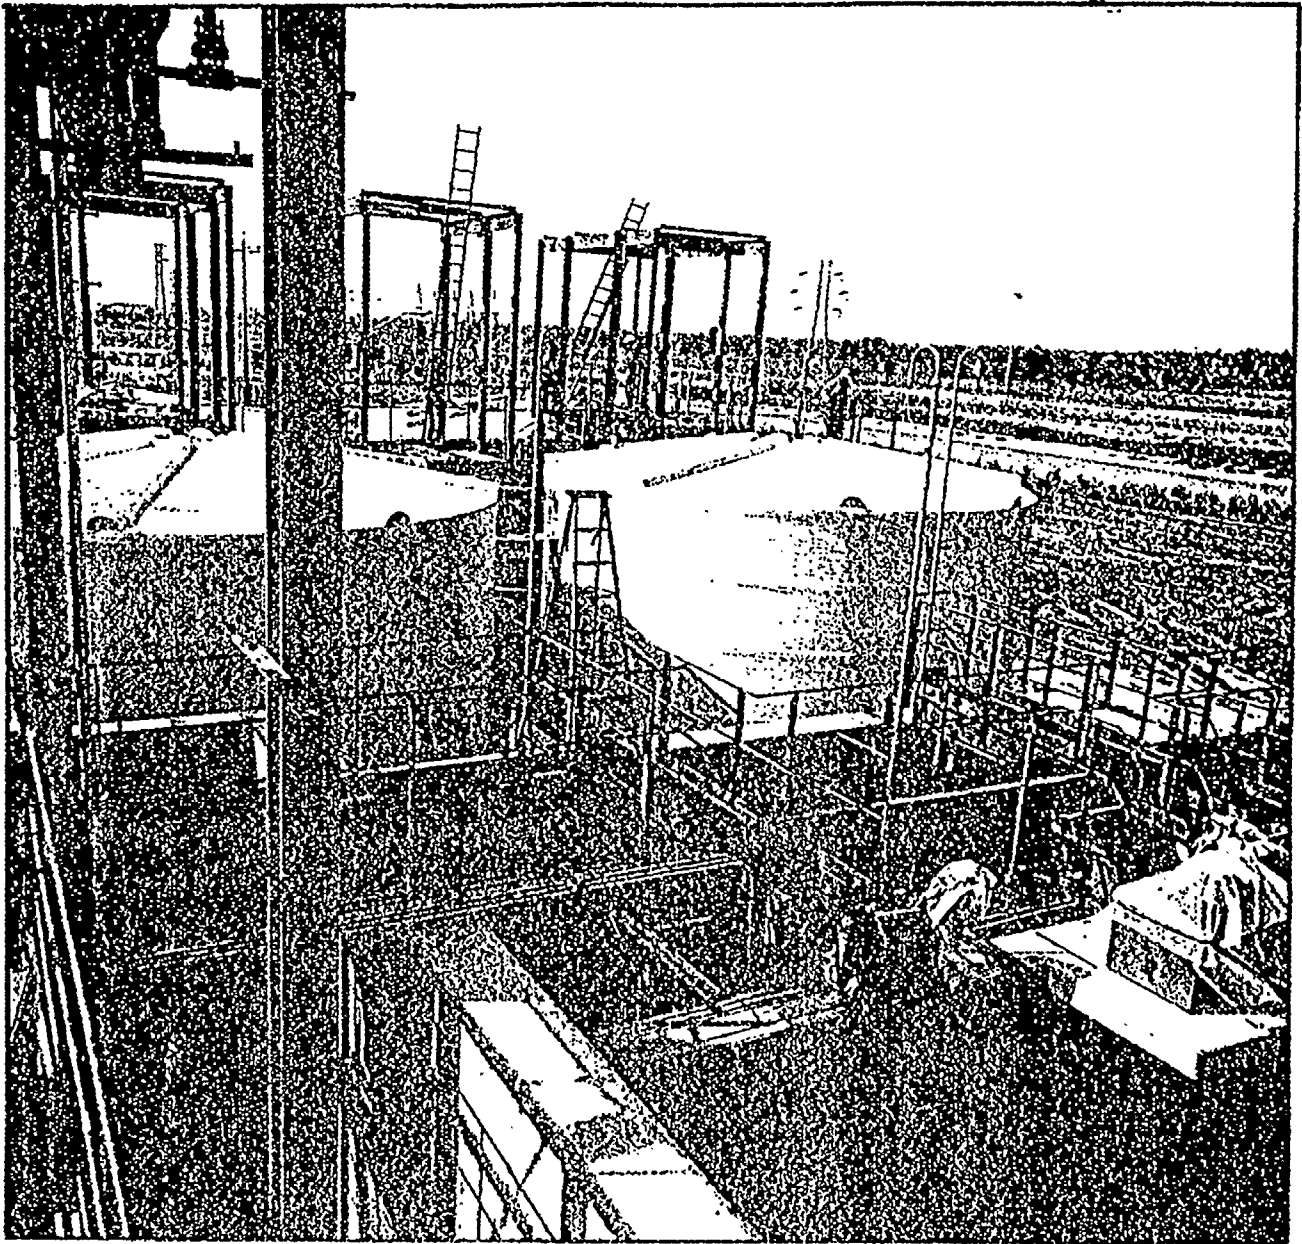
POLLUTION ABATEMENT - PICKLE WASTE DISPOSAL
